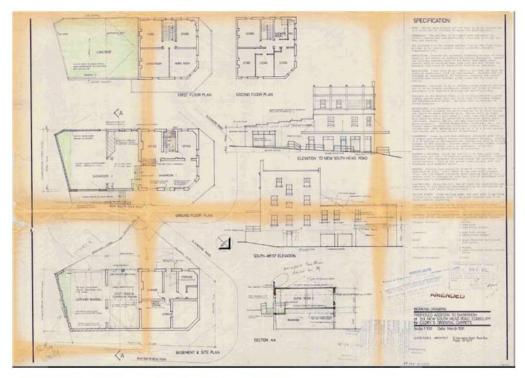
BA419/81 which approved works to the ground floor level showroom.
